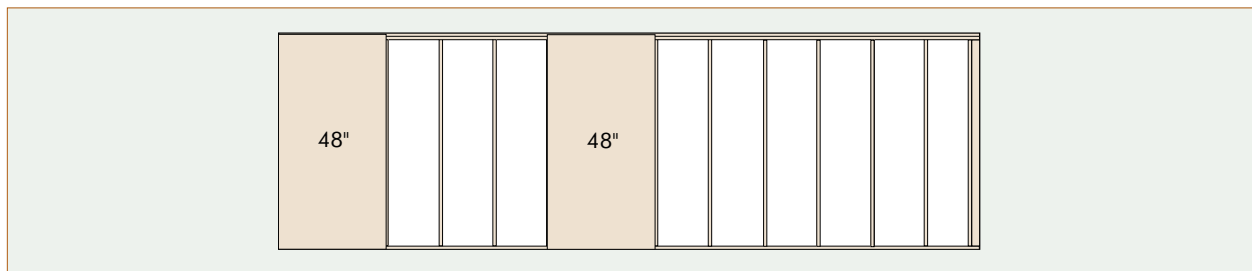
Panel layout detail of north and south wall for Tests 5a, 5d and 5d(8C). The end with no bracing panels served as the corner return for the east wall.
